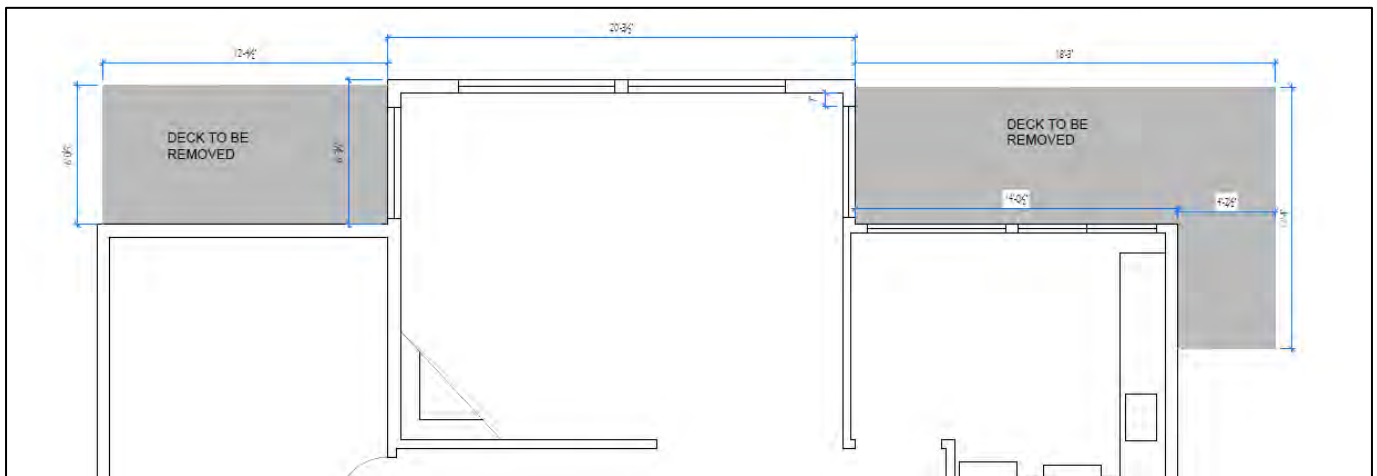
Aerial view of the proposed demolition of the existing decks. Drawings provided by Momentum Design Build.
